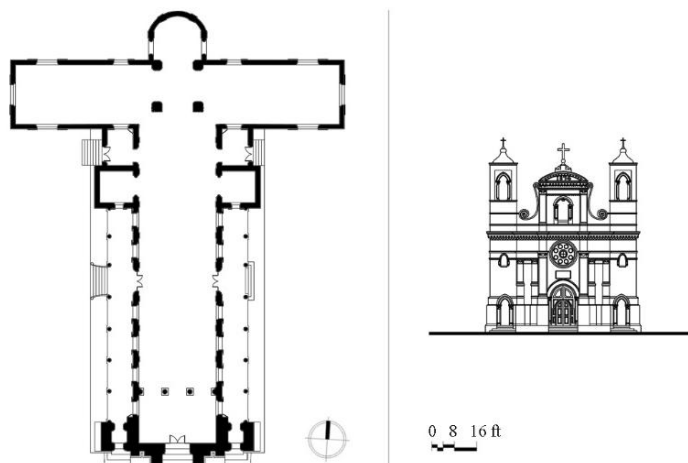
Floor plan and main façade of St. Mary's Cathedral, Galle
